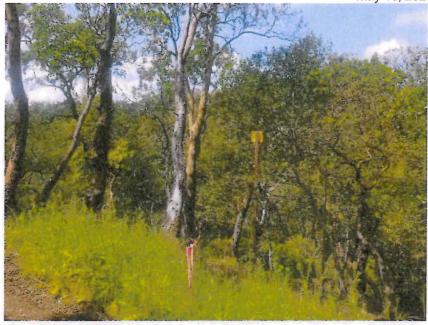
Proposed ADU, viewed from existing driveway cut, looking north.
